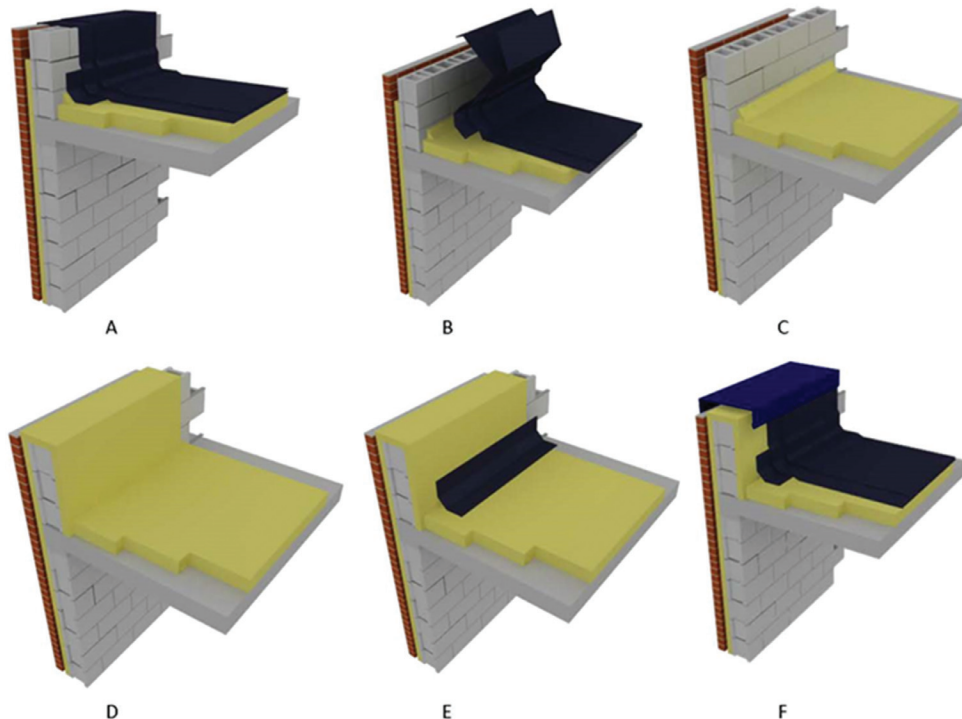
Parapet wrapping on CMU block wall with concrete roof.
